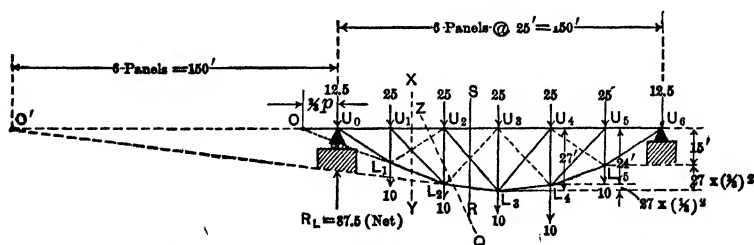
Truss with parabolic bottom chord showing dead panel loads.
